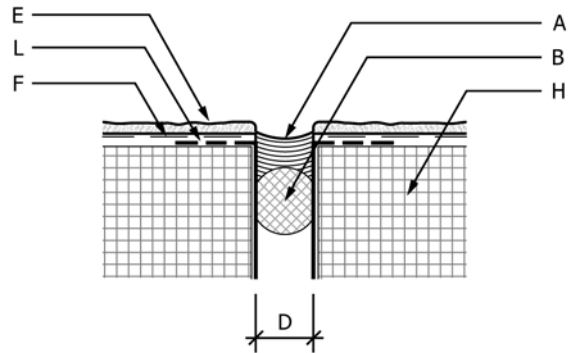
Sealant Butt Joint Seal (Accessory to Accessory)
